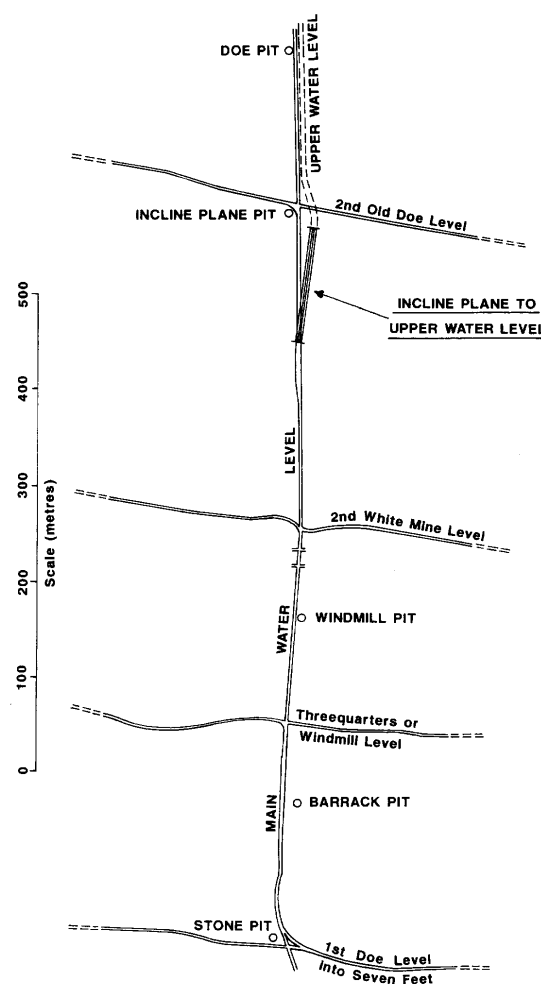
Section of the Bridgewater Canal showing the inclined plane and side canals
